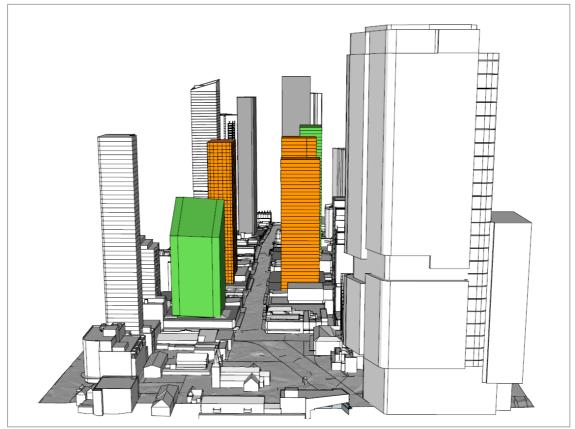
Test #2 Sites 'b, c, d, e and f' - looking north towards the River
